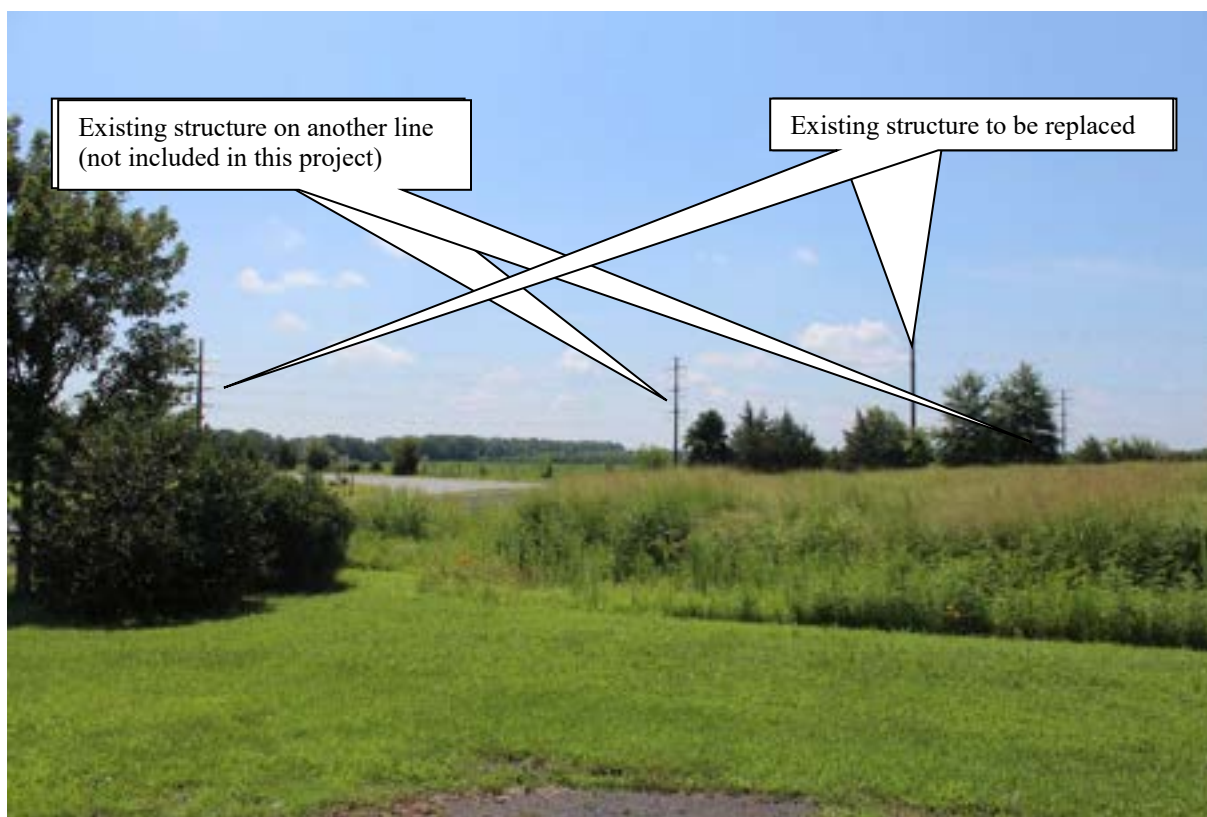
Photo location 8- View from driveway to Rose Hill across road (multiple existing project structures and other structures visible), facing south.
